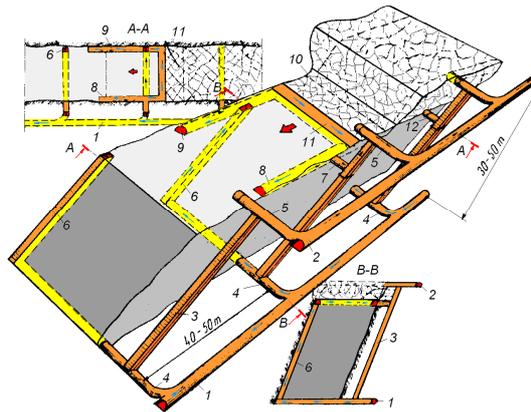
Mining method in horizontal slices and directionally longwall coal face
